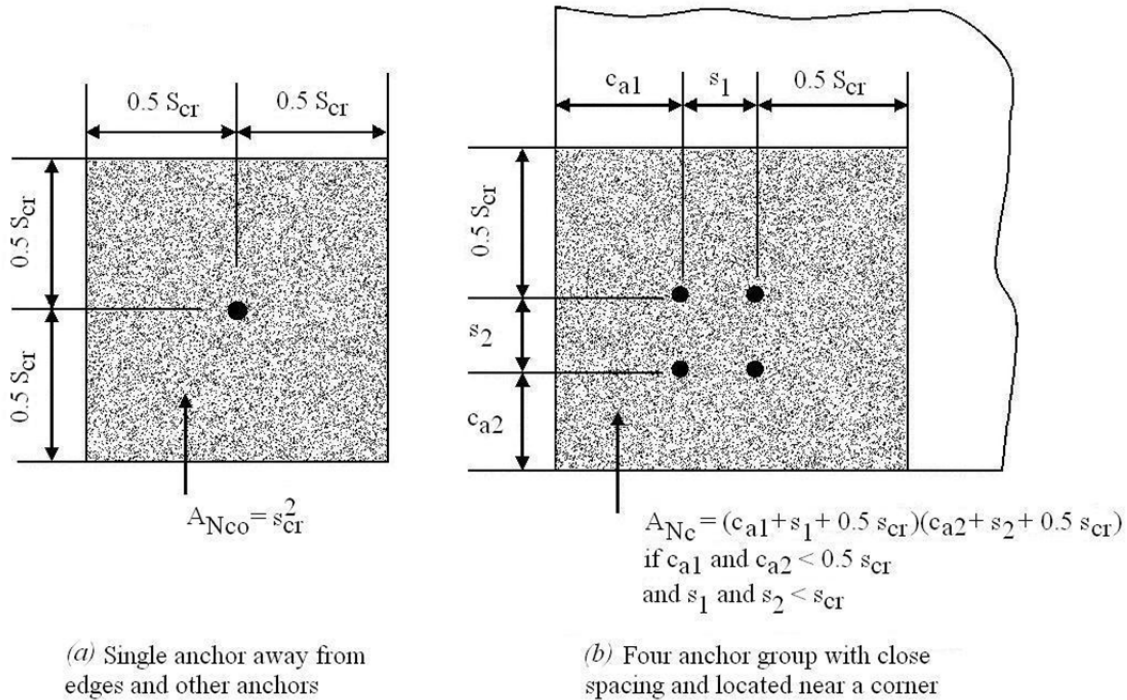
Projected Concrete Failure Areas for Adhesive Anchors [15]
